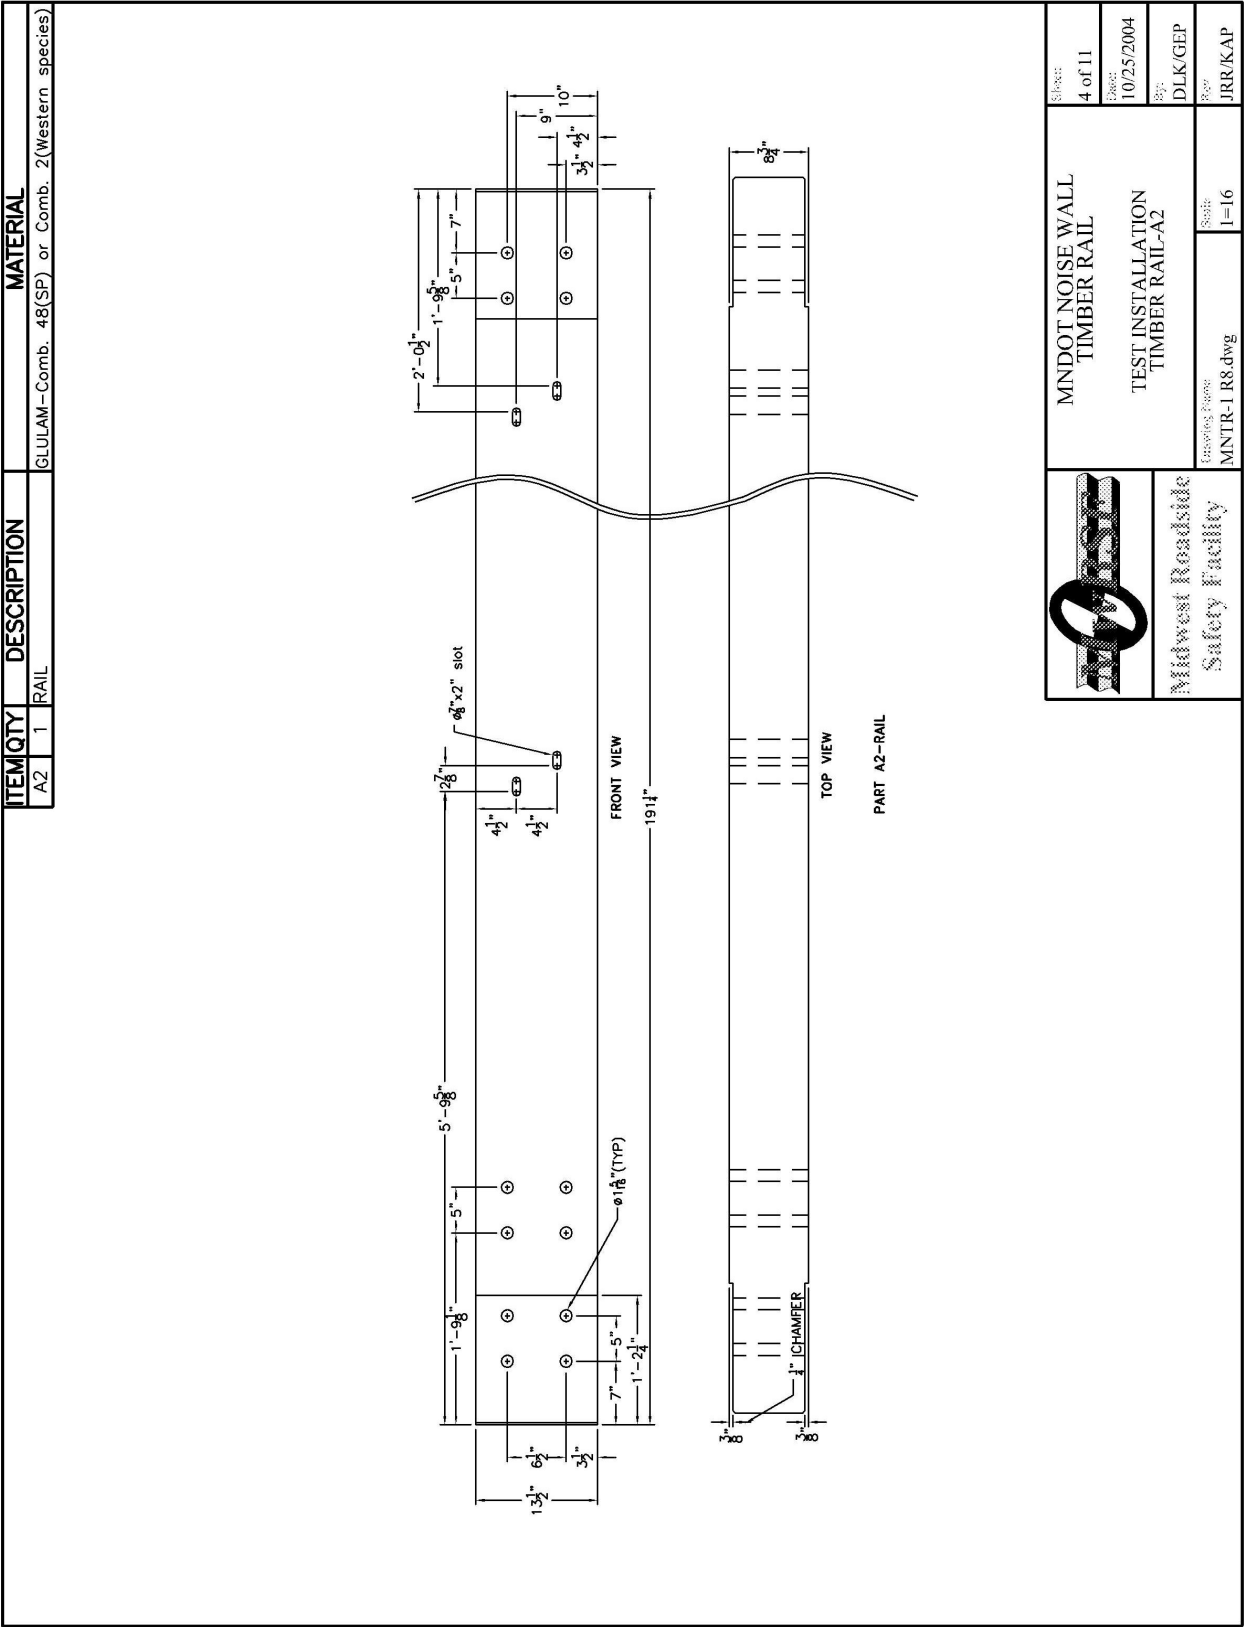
Mn/DOT's Timber Rub Rail Design Rail Details (English)
